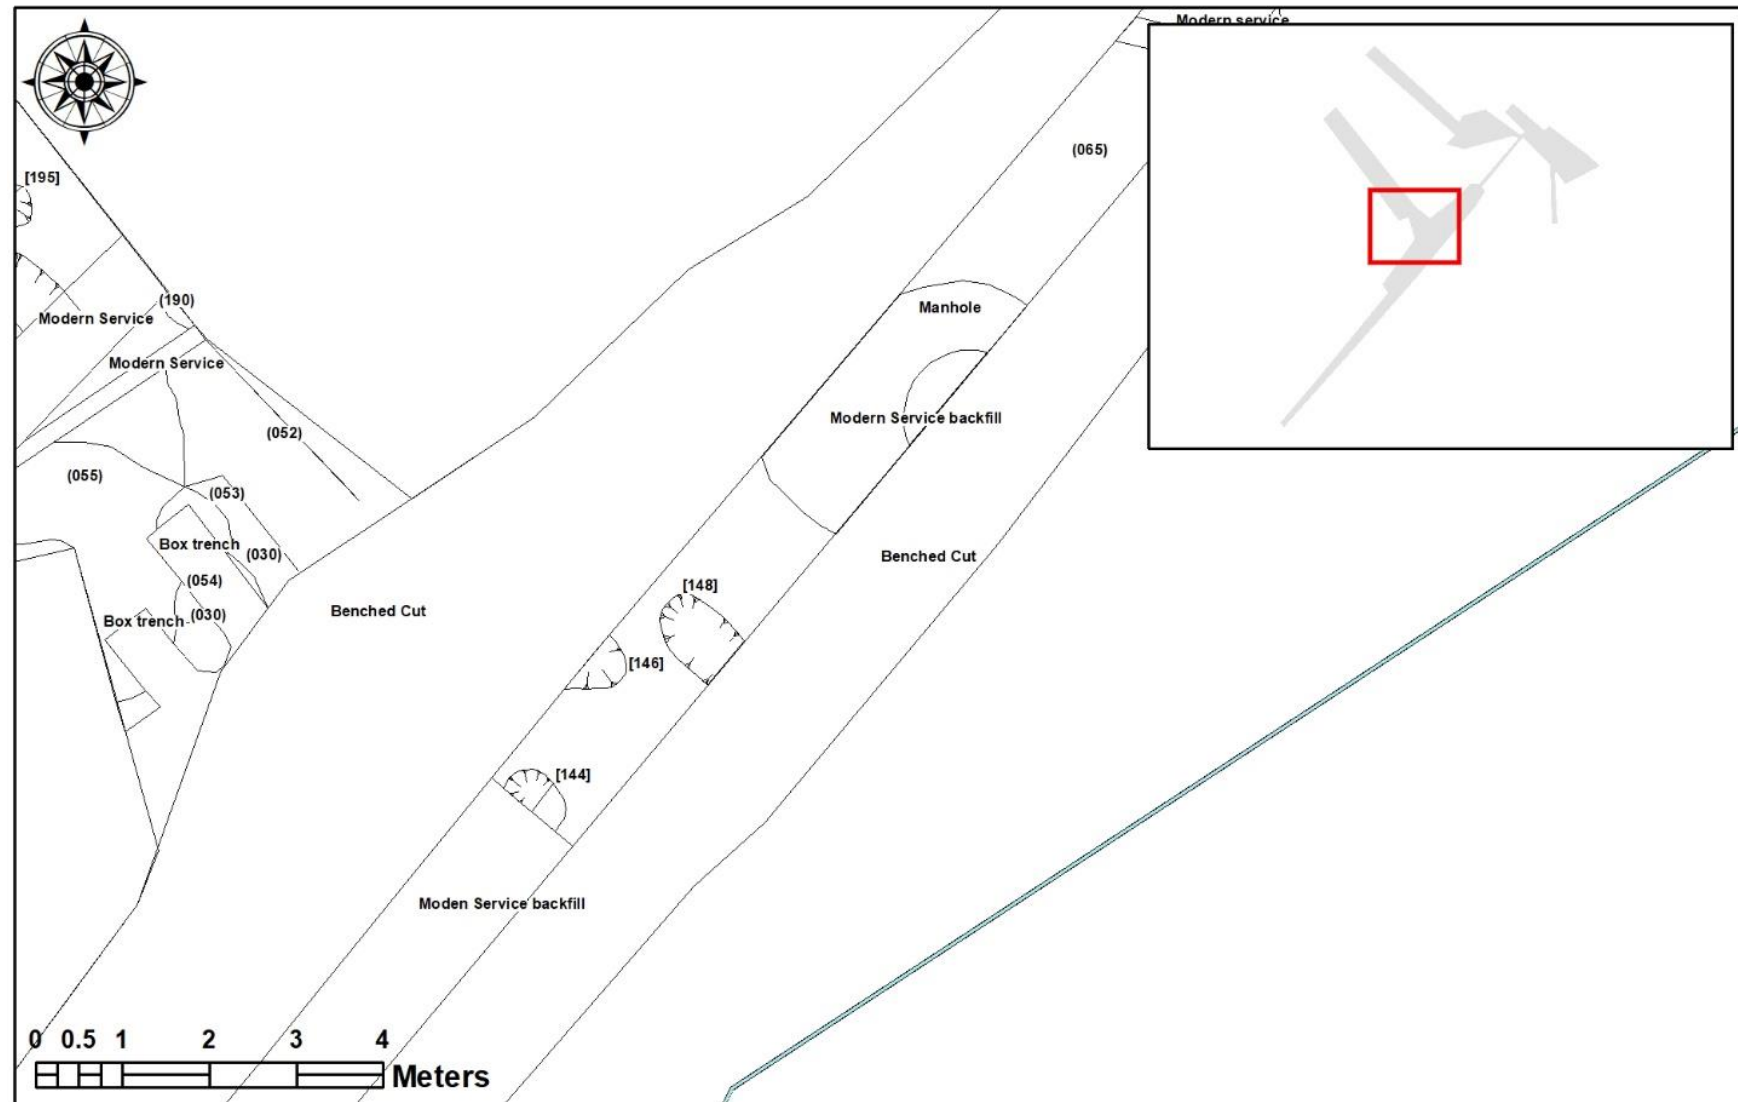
Post-excitation plan of central section of Sewage Trench N-S – see red rectangle for specific location
